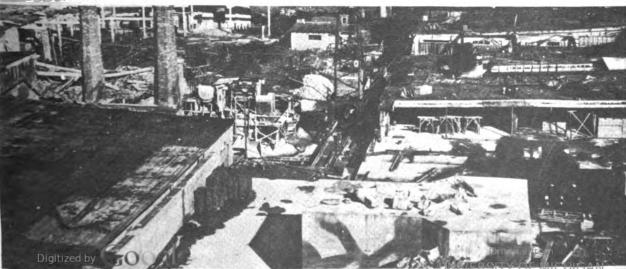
V: Looking northeast - showing portions of Bldg. R still standing. Bldg.
